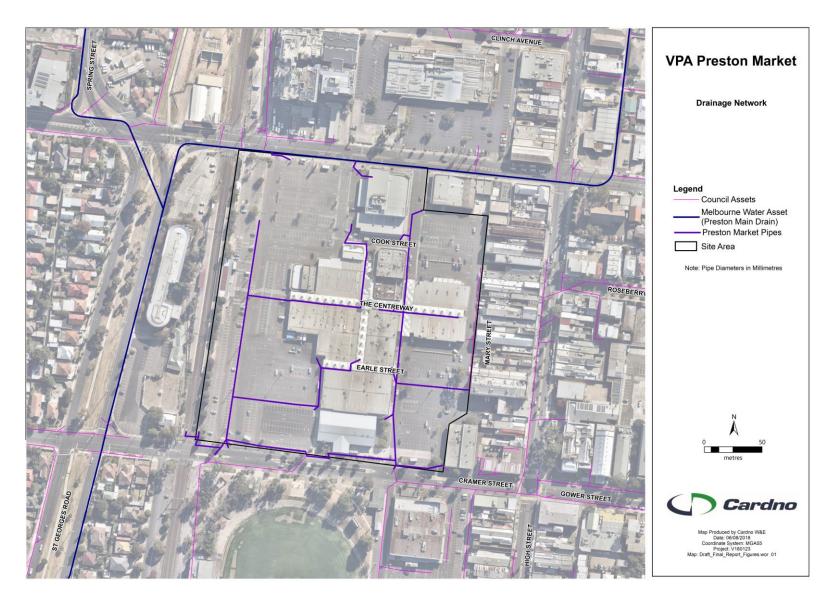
Existing stormwater drainage infrastructure within Preston Market
